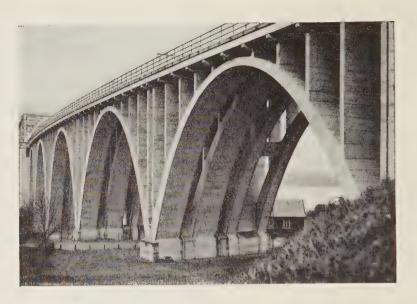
Danish State Railways: Access bays to Little Belt bridge.
